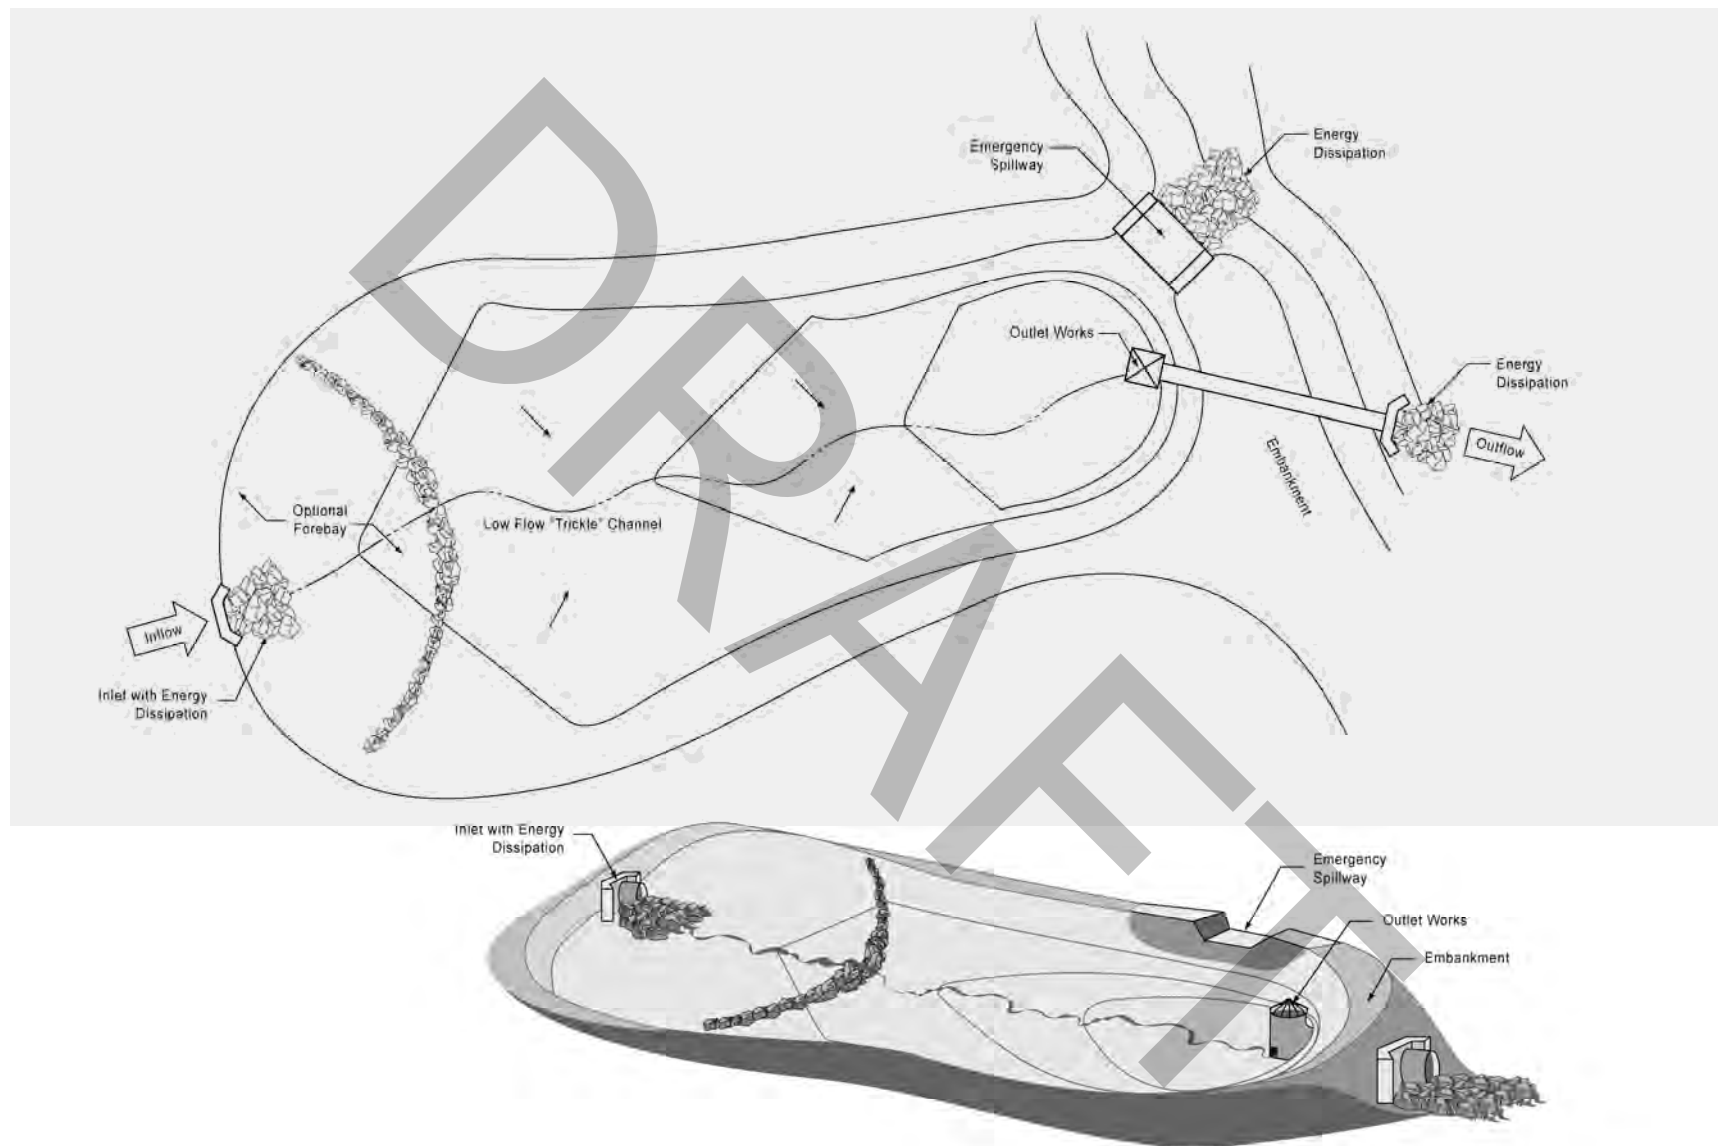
Plan and Section of Typical Flood Control Detention Basin
